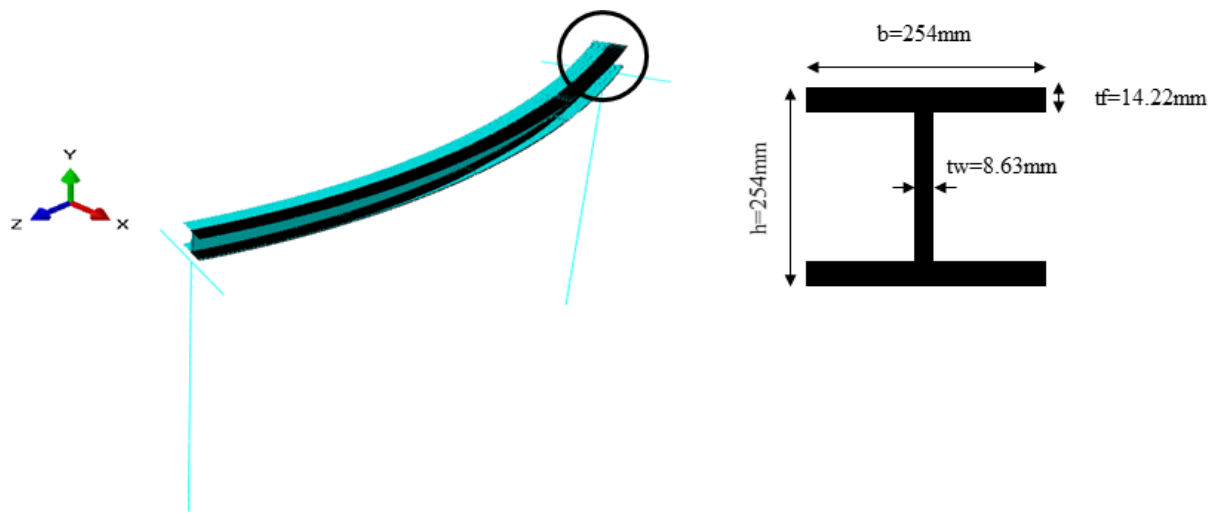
Finite Element Model of I-Shape Girder Curved Bridge
